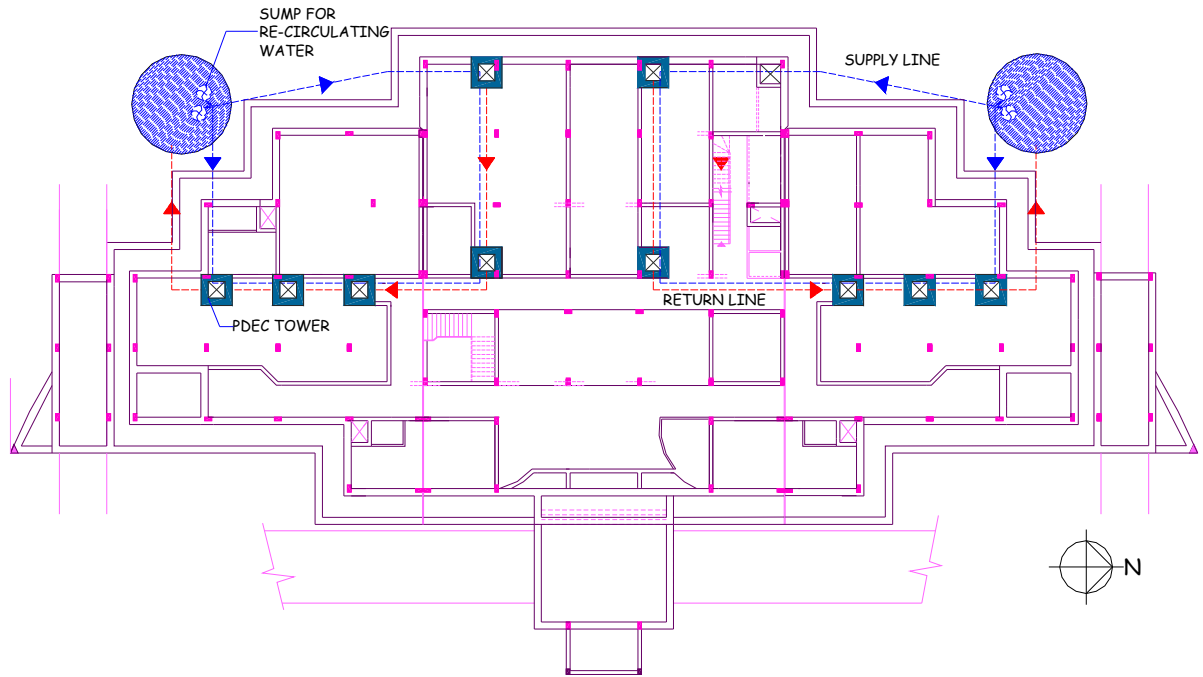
Layout plan of I.G.P. Complex, Gulbarga
